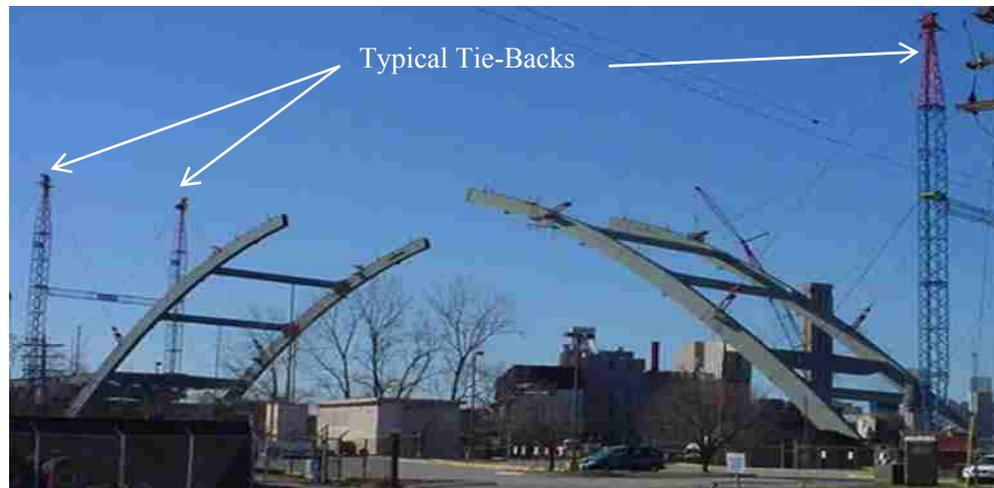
Example of Cantilevered Construction. Image from Hague and Blakemore (2004)
